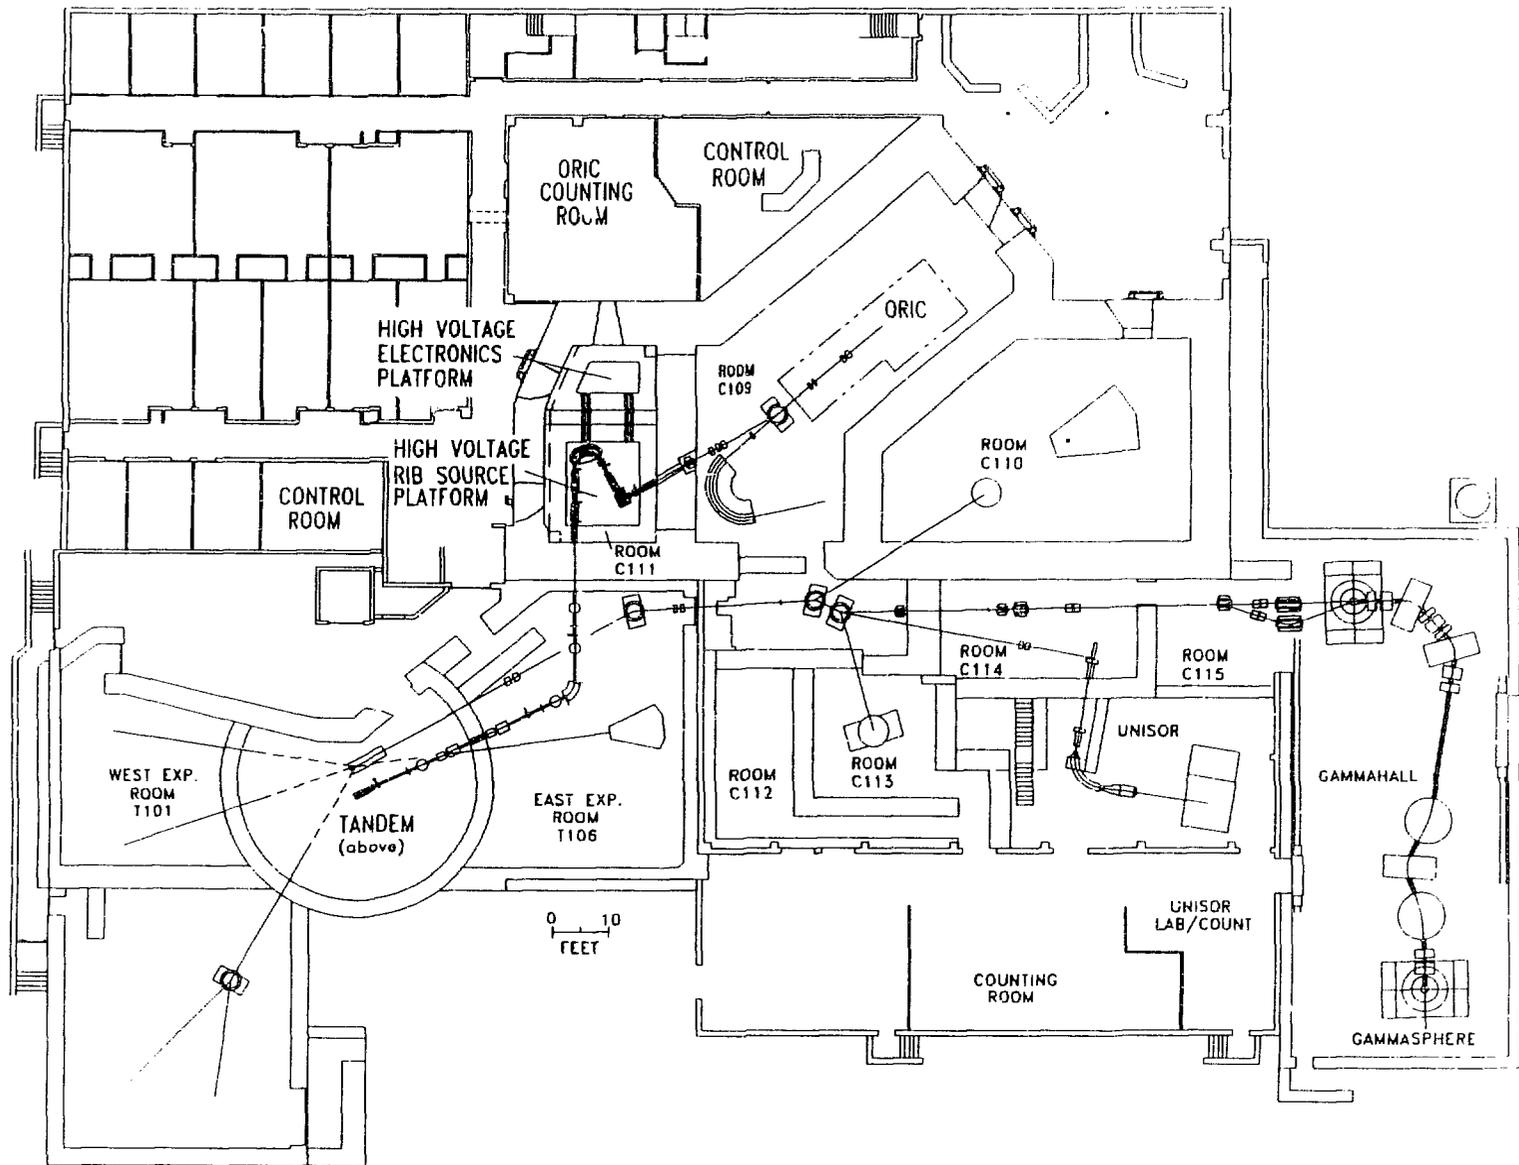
FLOOR PLAN OF THE HHIRF SHOWING THE NEW RIB PLATFORM AND ASSOCIATED BEAM LINES. ALSO SHOWN IS THE PLANNED GAMMAHALL ADDITION.
